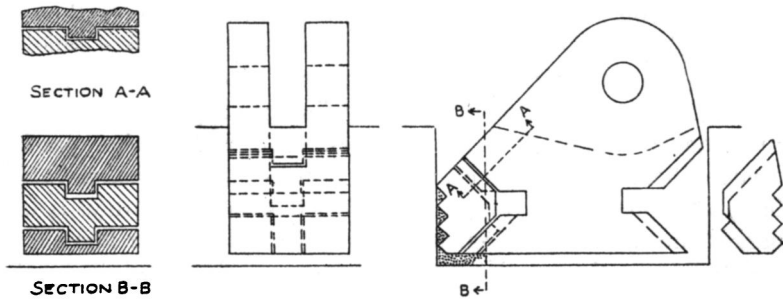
ANCHOR BLOCK FOR TYPE 1 FRAME
